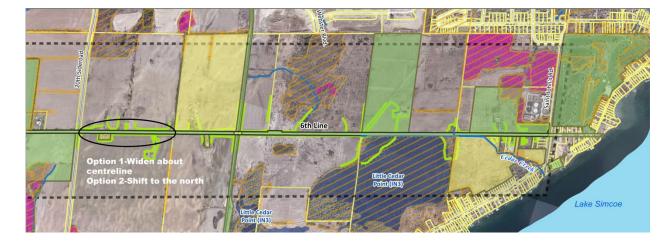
Segment 3 – 20 Sideroad to east of Future Alcona Road South
